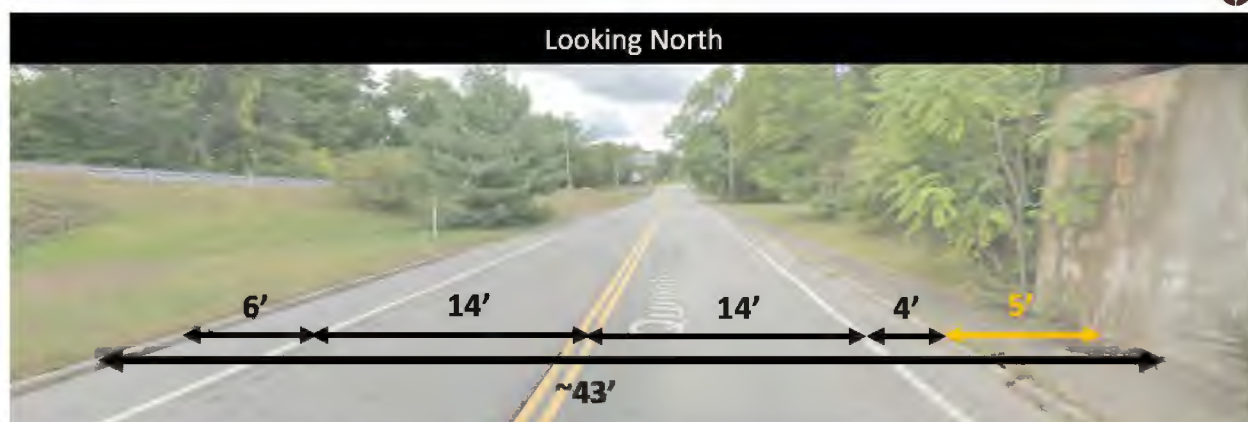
Existing Conditions – Quinobequin Road (Location 6)
